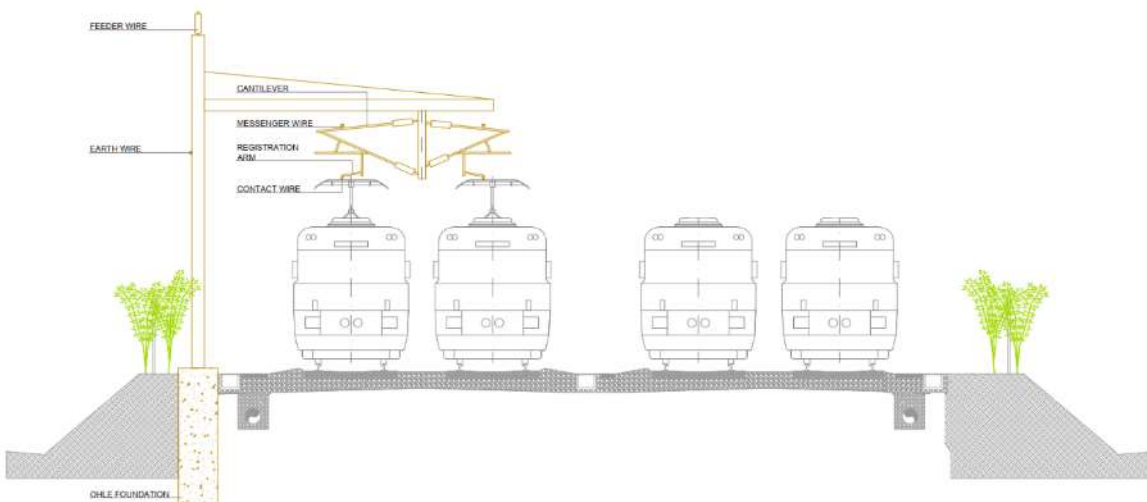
Typical OHLE Arrangement in 4-track Section (Northern Tracks Electrified)
